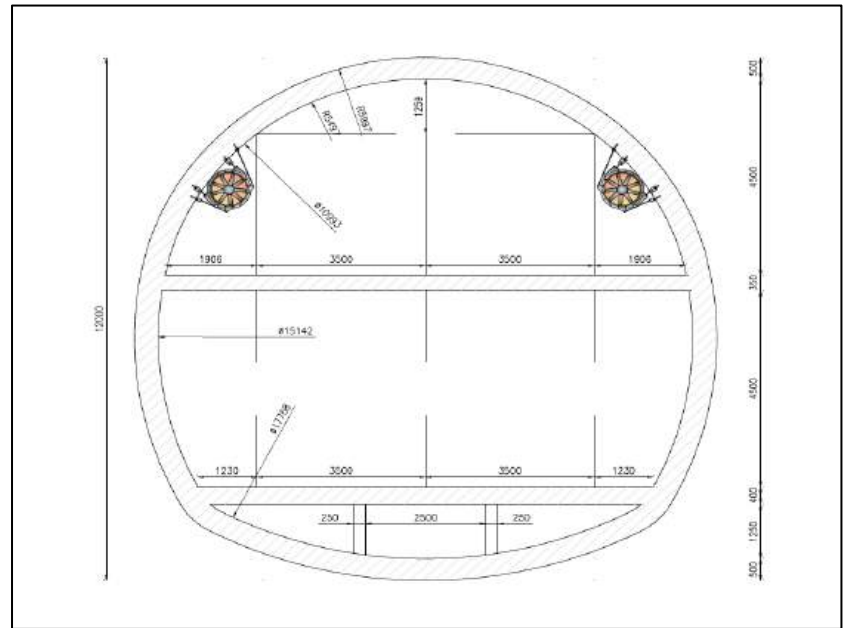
4-Lane Modified Horse Shoe Tunnel Typical Cross Section
